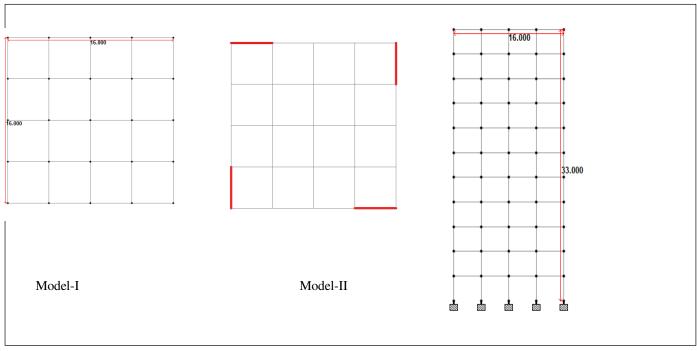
Staaad Pro Plan, Elevation, Model-I Bare Frame & Model-II Shear wall at corner
